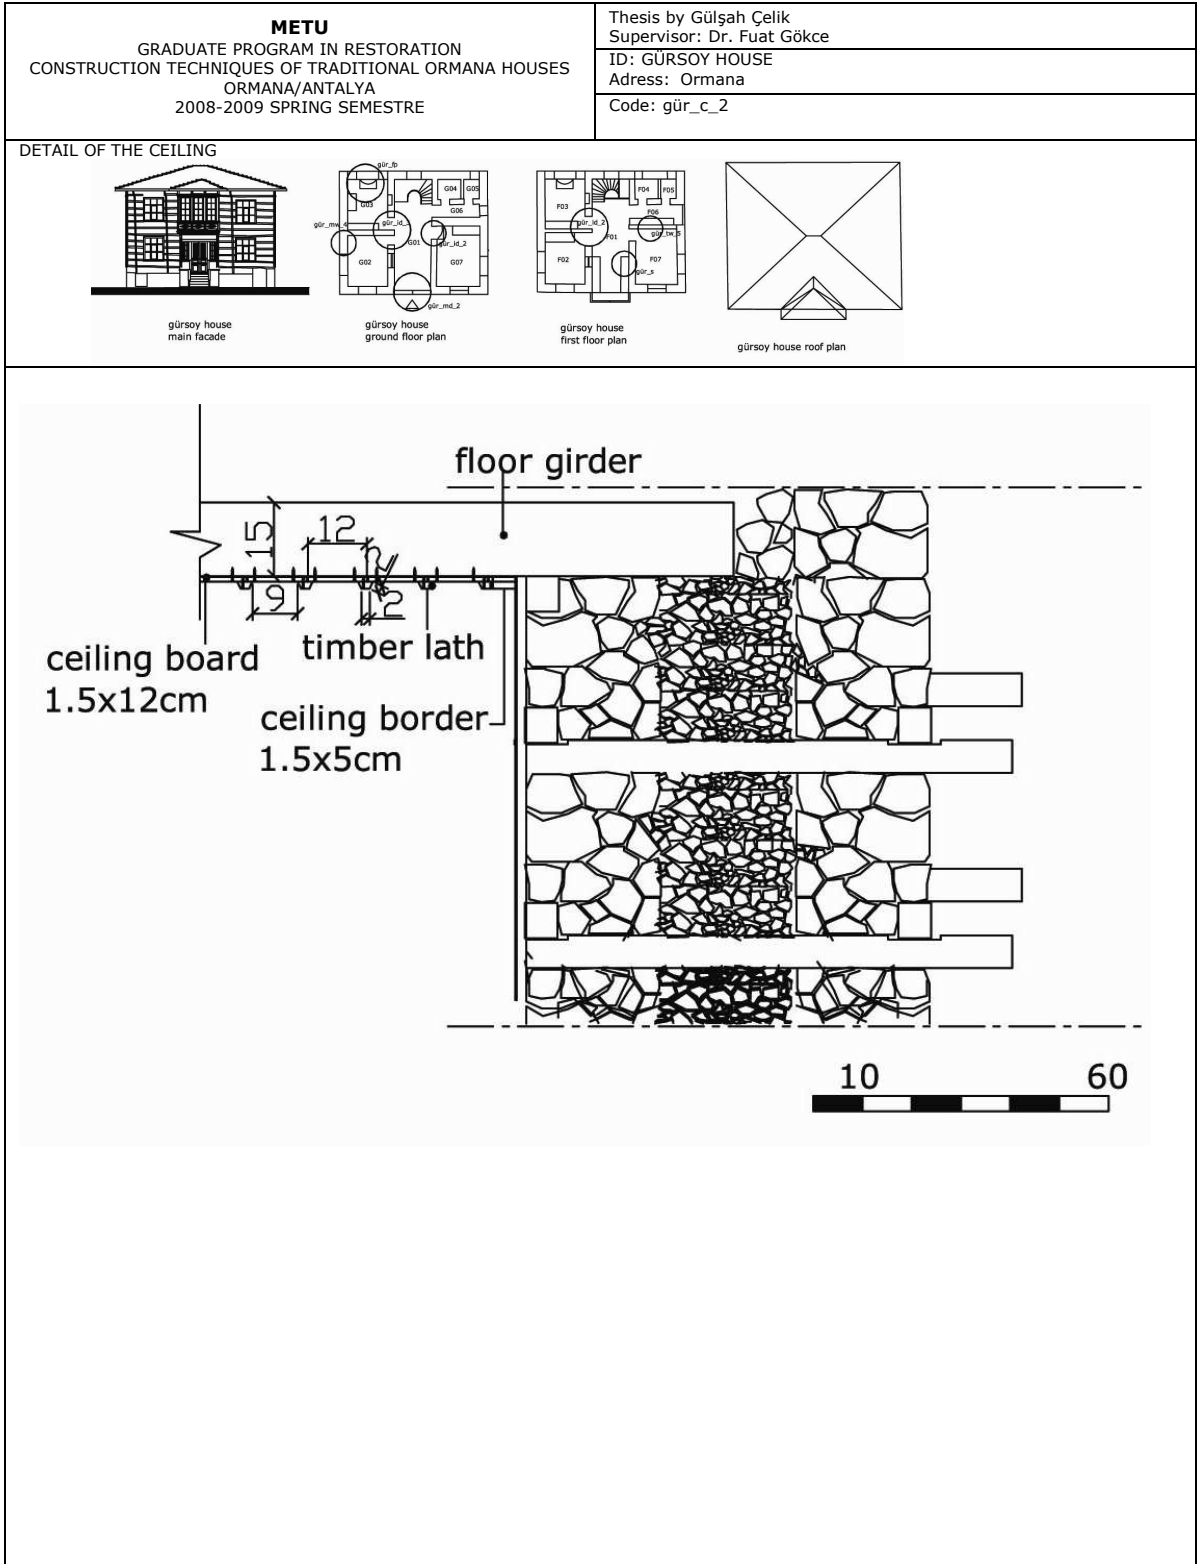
View from ceiling of the Gürsoy House. Çelik, 2008
